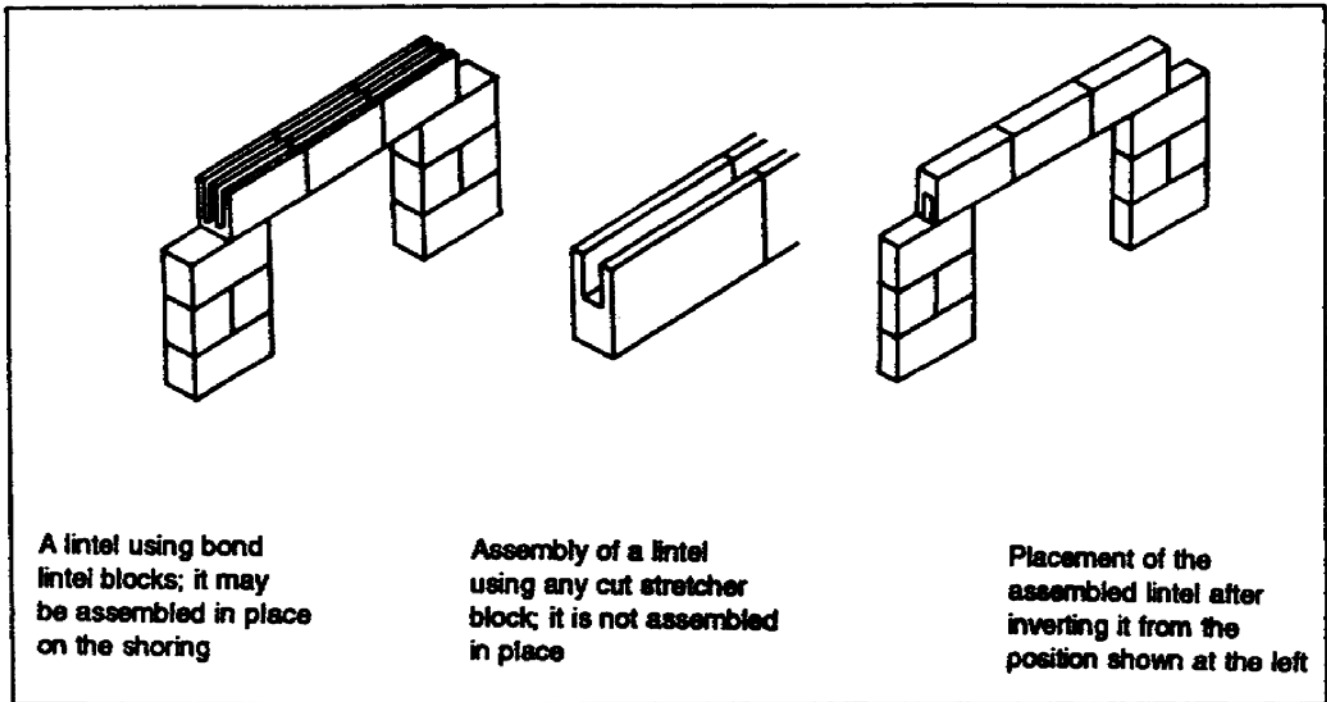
Lintels made with concrete blocks, mortar, and reinforcing steel bars
